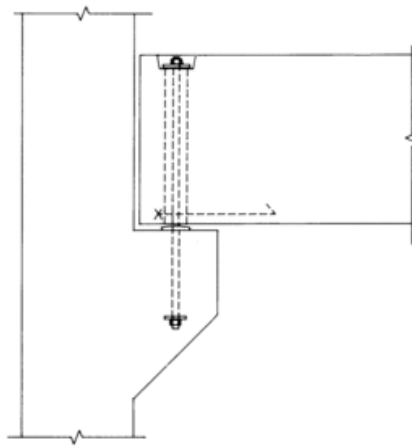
Prefabricated concrete beam and column connected with a bolt, adopted from Betongvaruindustrin (2005).
